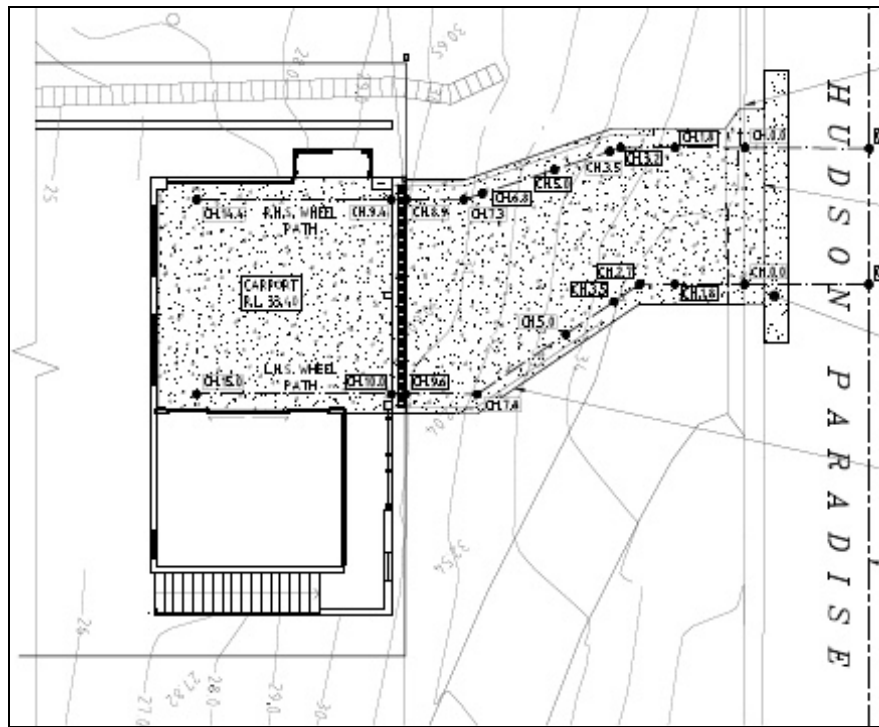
The proposed driveway layout is restricted in its layout due to significant site constraints and conflicts with the location of Tree 35. (Source: Driveway Plan and Long Sections, by Taylor Consulting, dated 30th August 2022)
